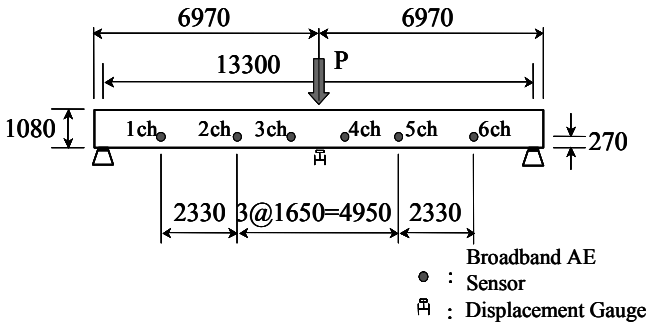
Test set-up for the cyclic bending test in a dismantled girder.
